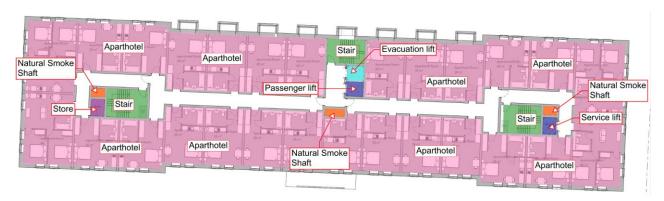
Proposed Aparthotel Floor Plan (i.e. first-second)
